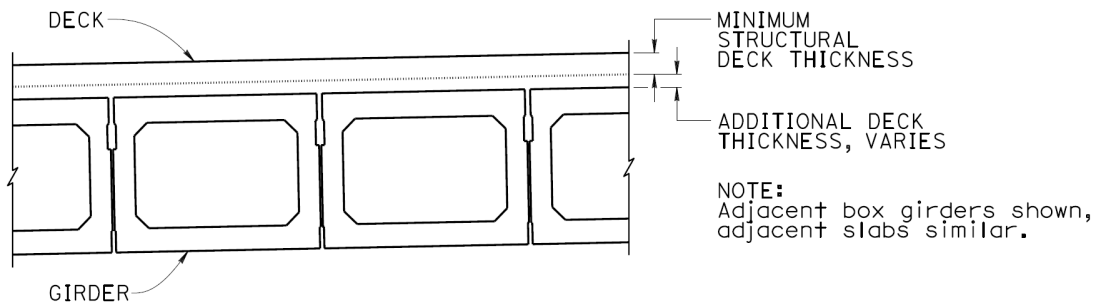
Section Showing Deck Thickness Variation on Adjacent Box Girders and Slabs
